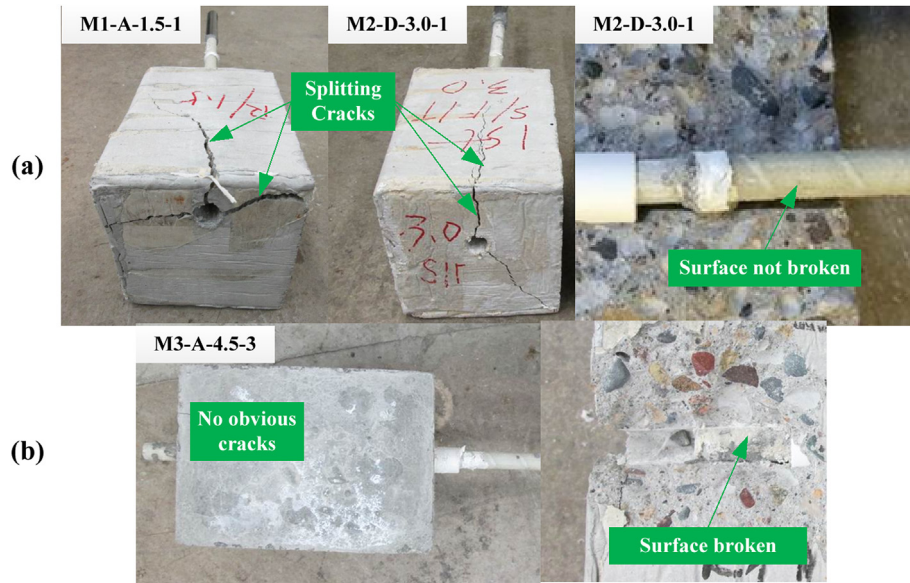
Typical failure modes for unconditioned and conditioned specimens: (a) splitting and (b) pullout failures.
